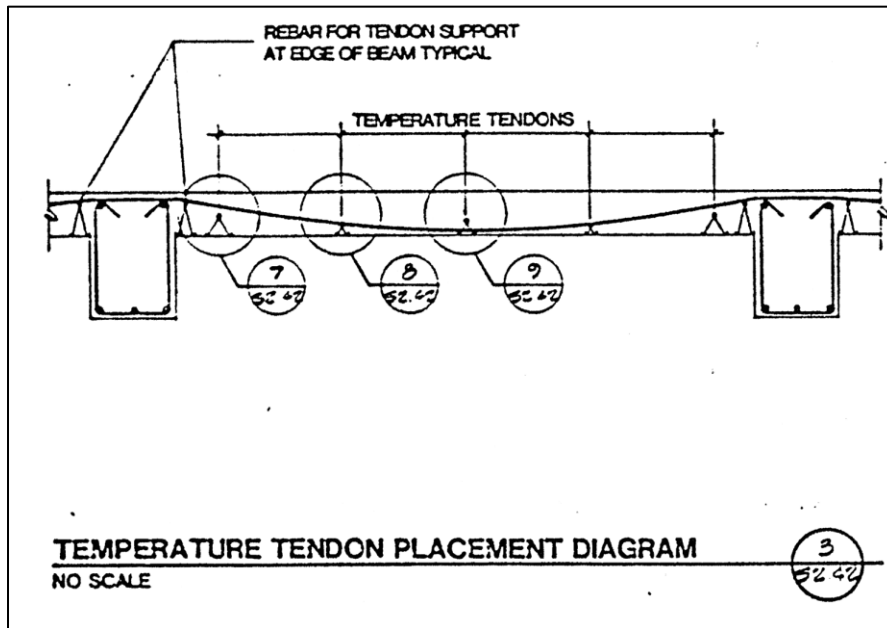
Schematic of the post-tension cable sag running through the slab between beam supports, from the as-built 1988 structural drawings.
